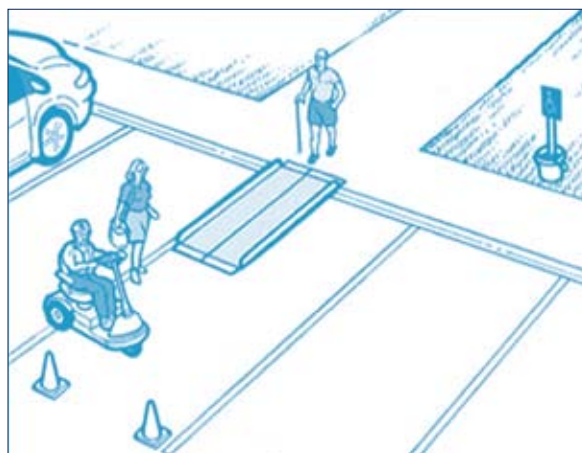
A portable ramp with edge protection is installed over a curb to provide an accessible route.
